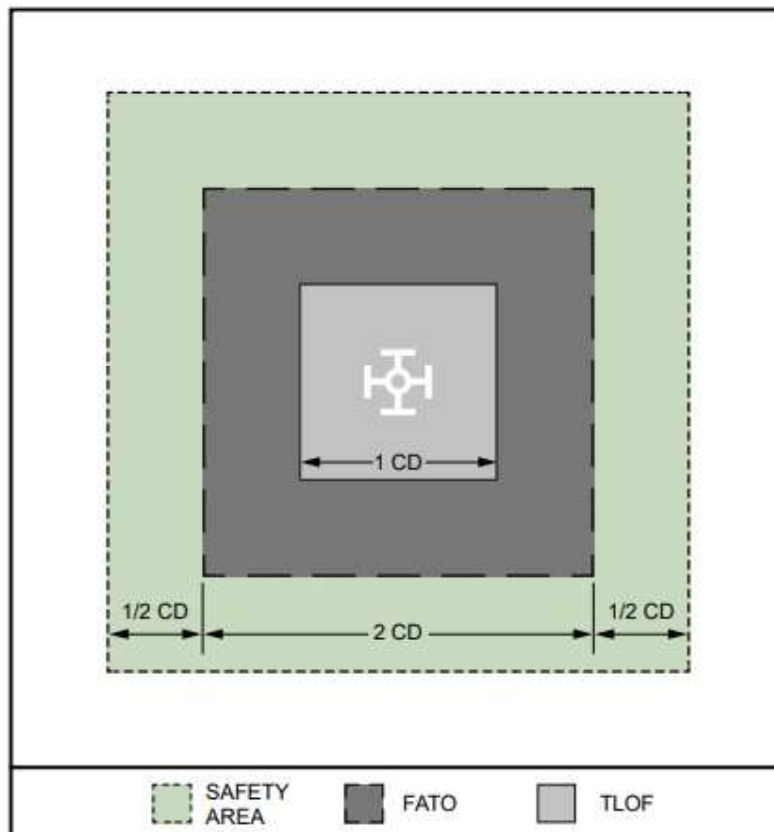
Typical arrangement of TLOF, FATO and Safety Area (Source: FAA)
